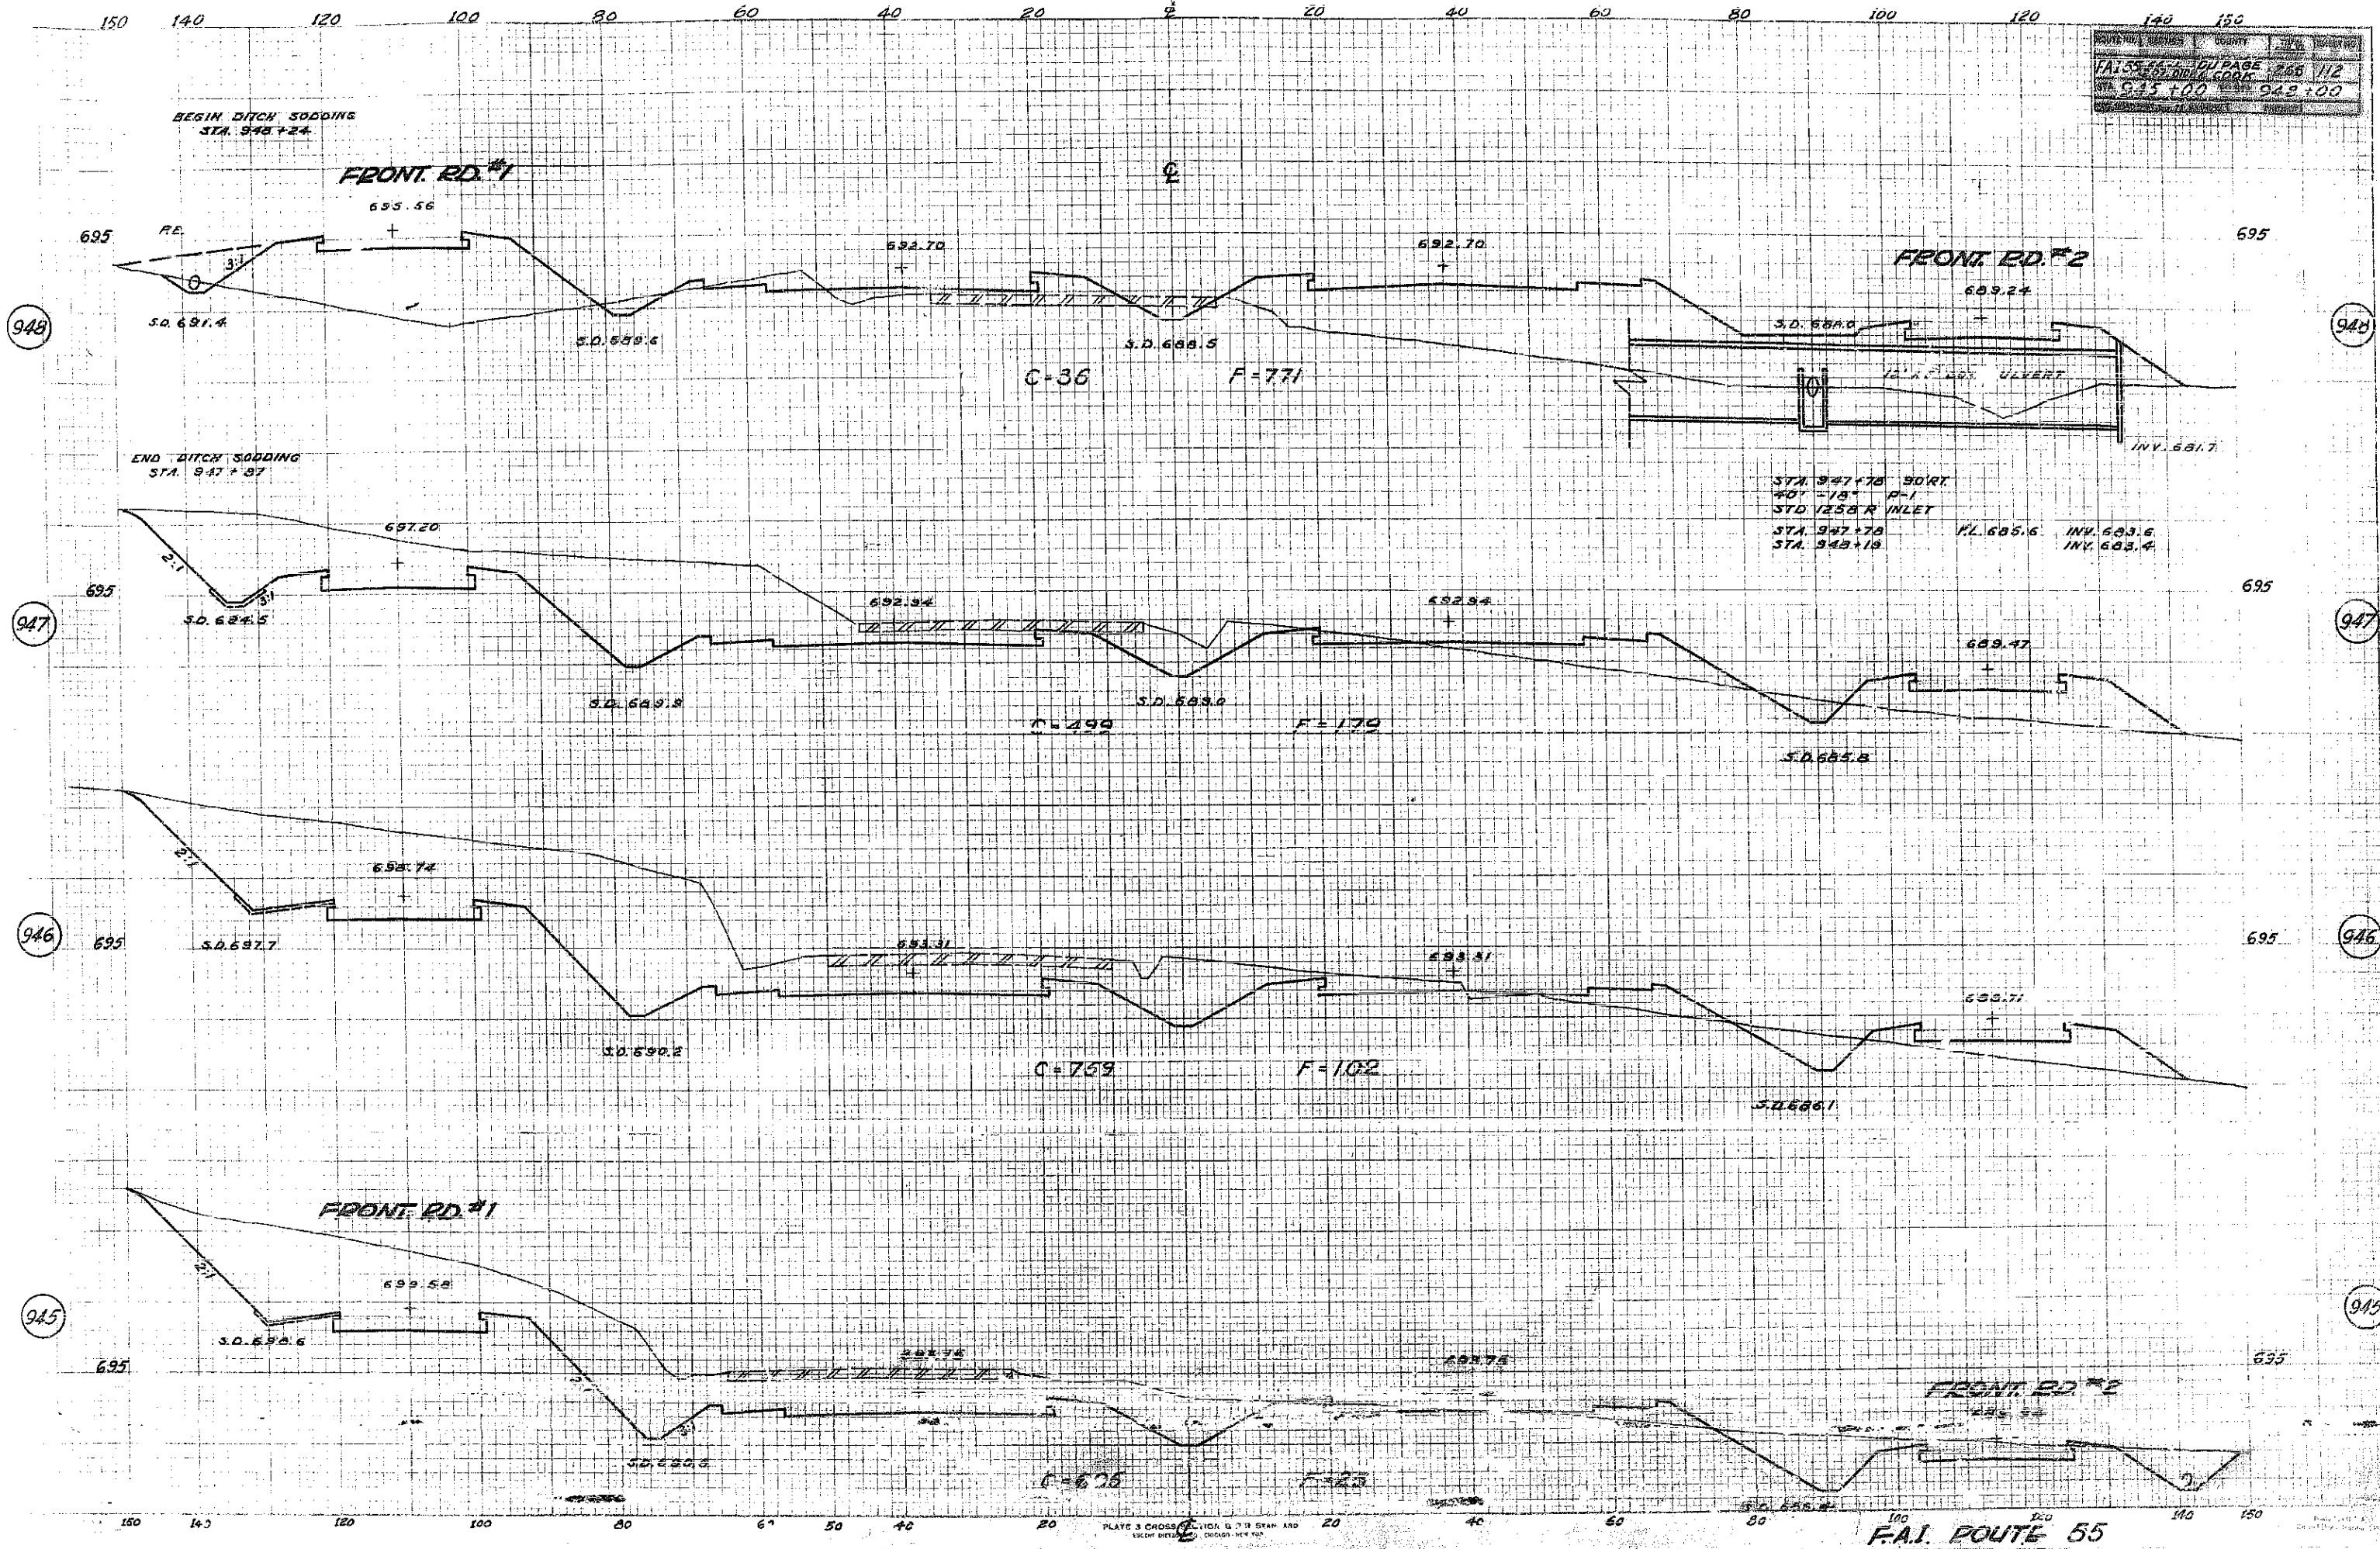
CROSS SECTION 6' 7' 8' SPAN AND
